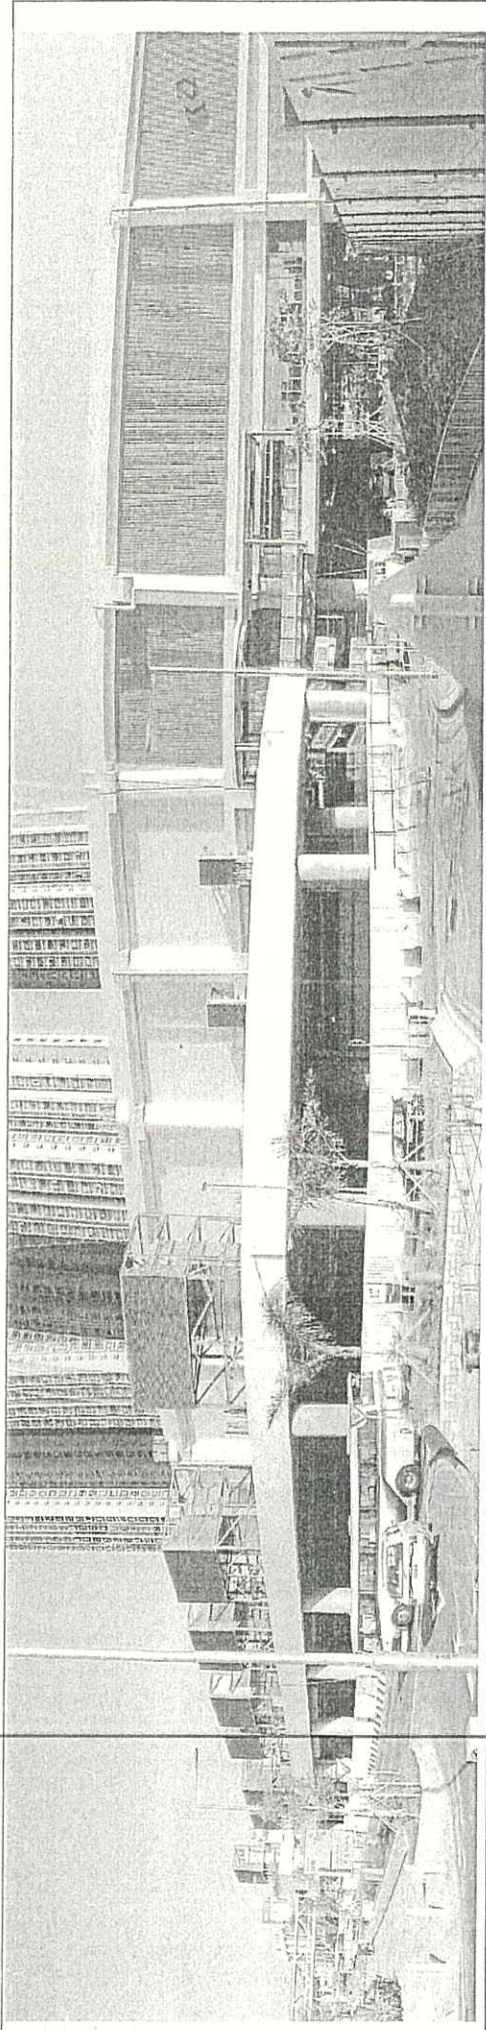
Completion of Landscaping Works at New Road Long Yat Road (YUL)
